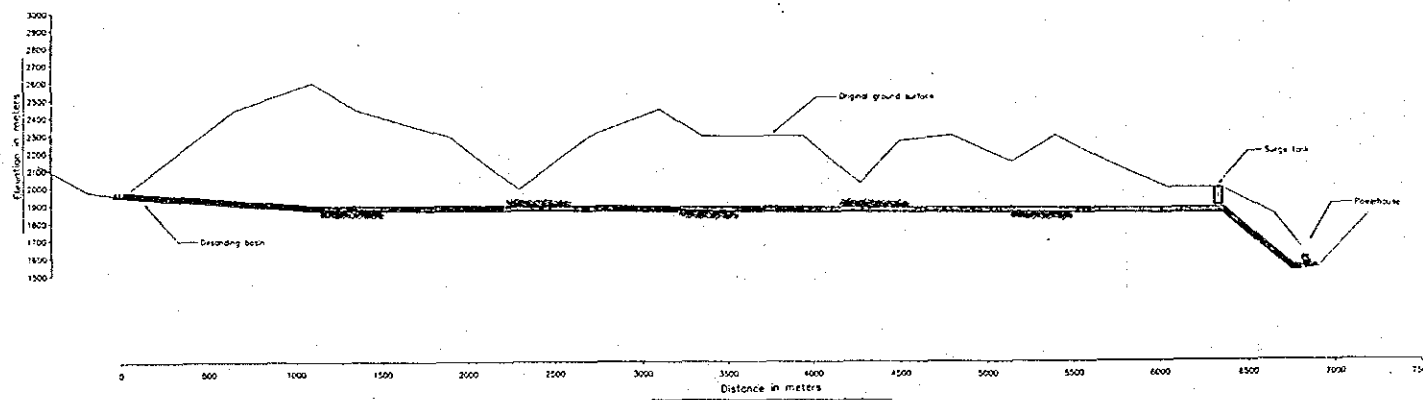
Preliminary Plan of SR-6 Scheme
